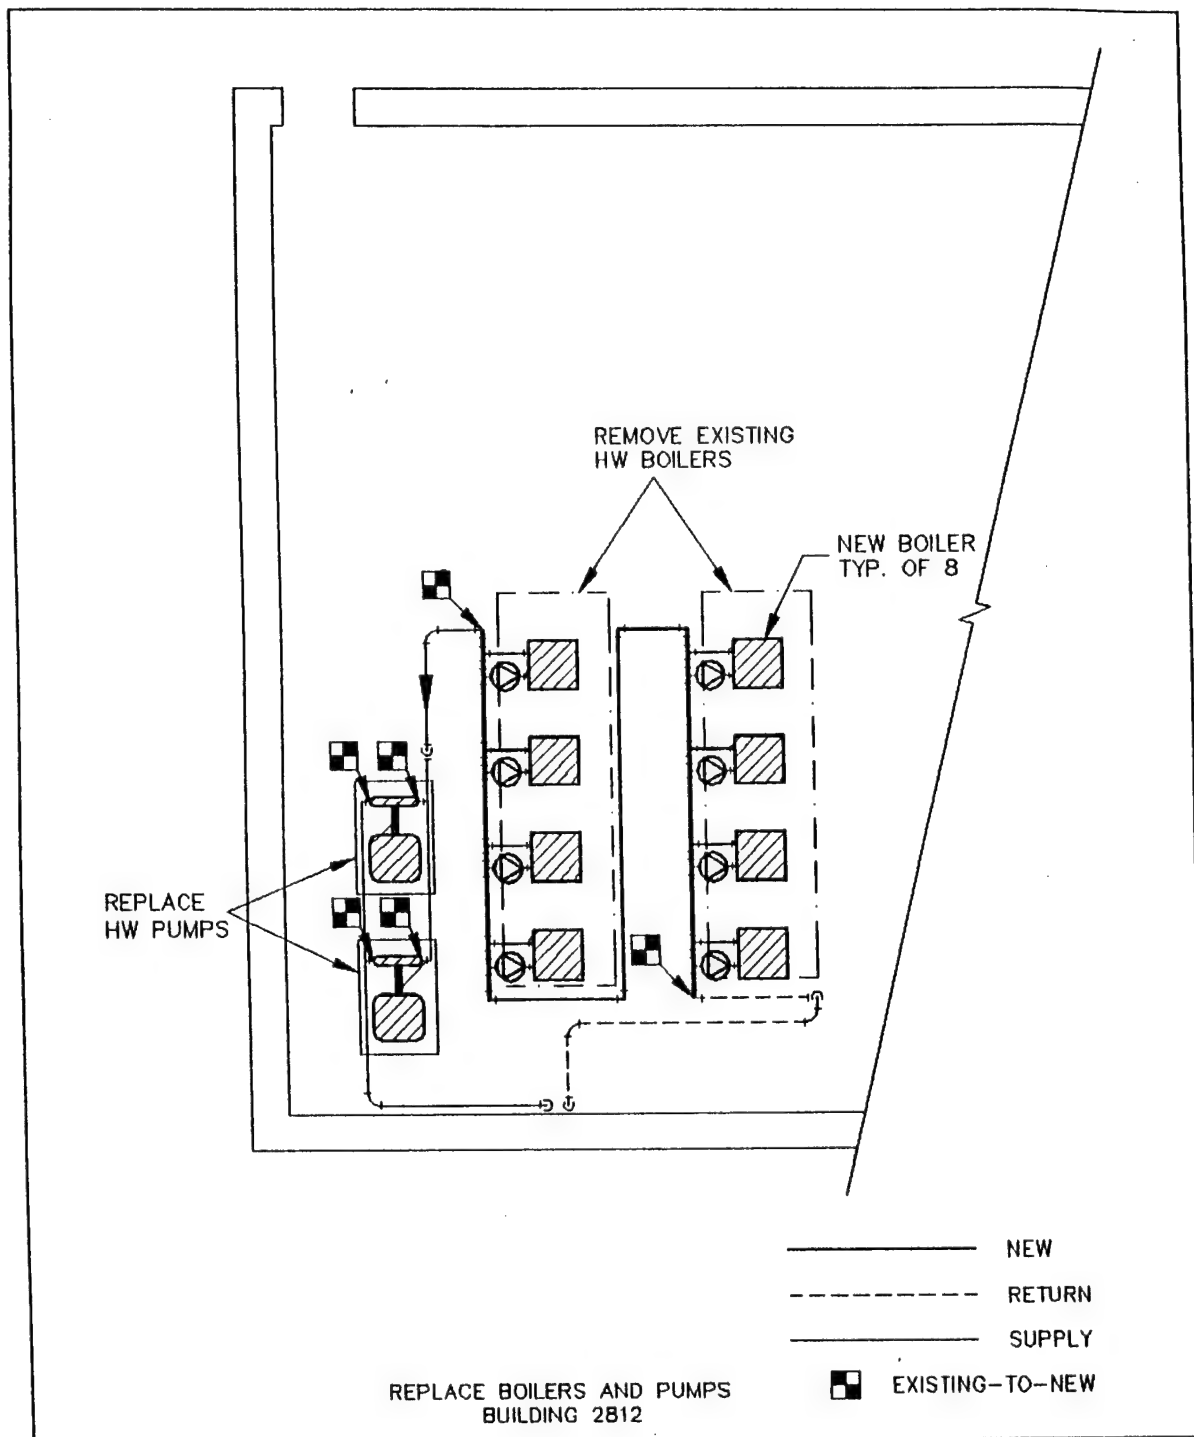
MECHANICAL ROOM LAYOUT, CENTRAL PLANT 2812
